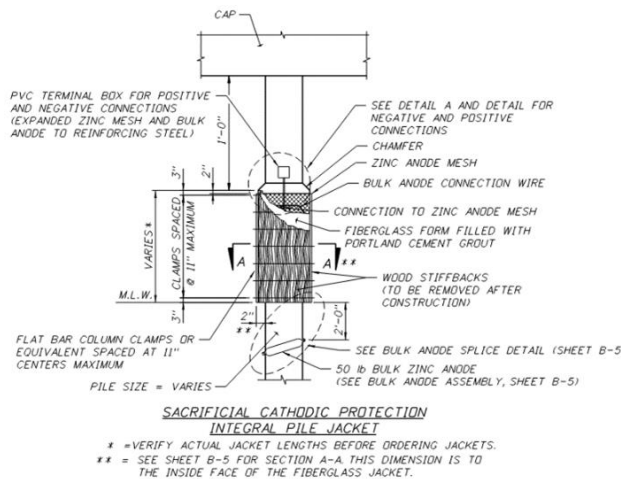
Typical elevation view detail of non-structural CP pile jackets.
